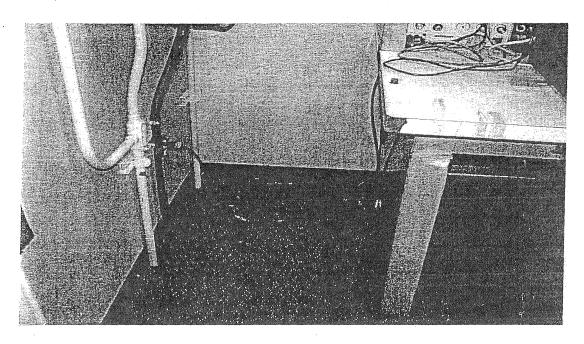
Sub Junction Level, Room SJ1, Southwest Corner.
